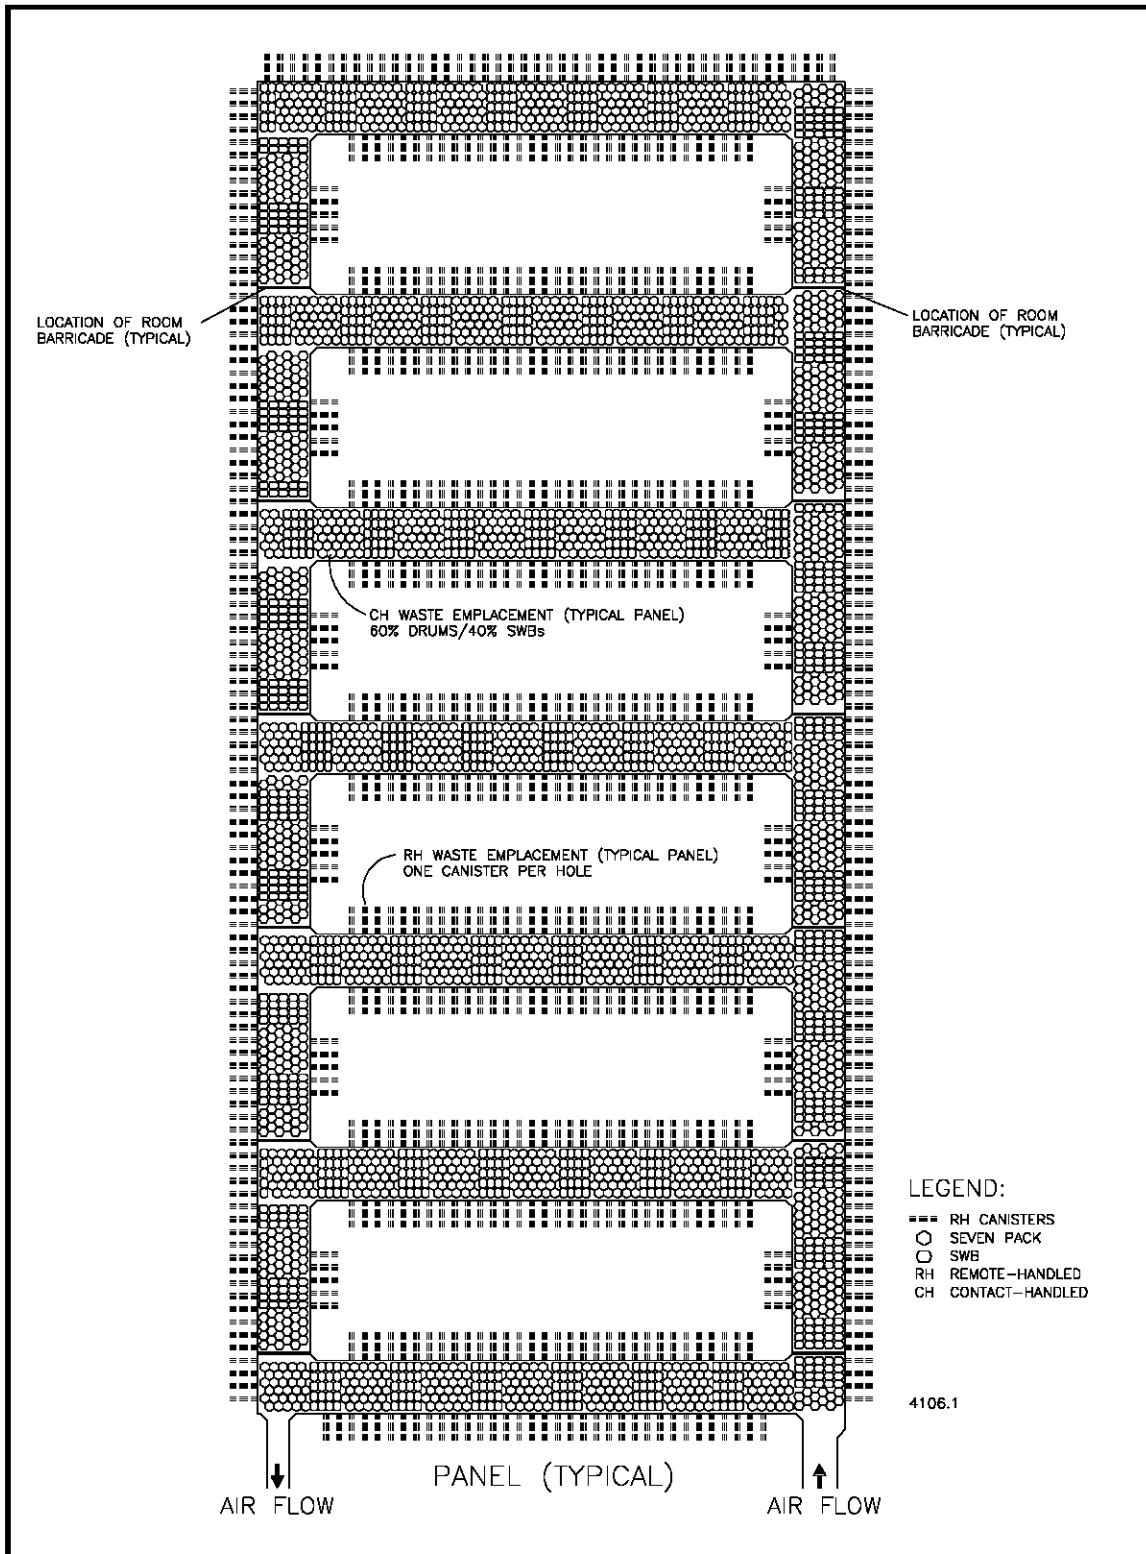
Typical RH and CH Transuranic Mixed Waste Disposal Configuration
